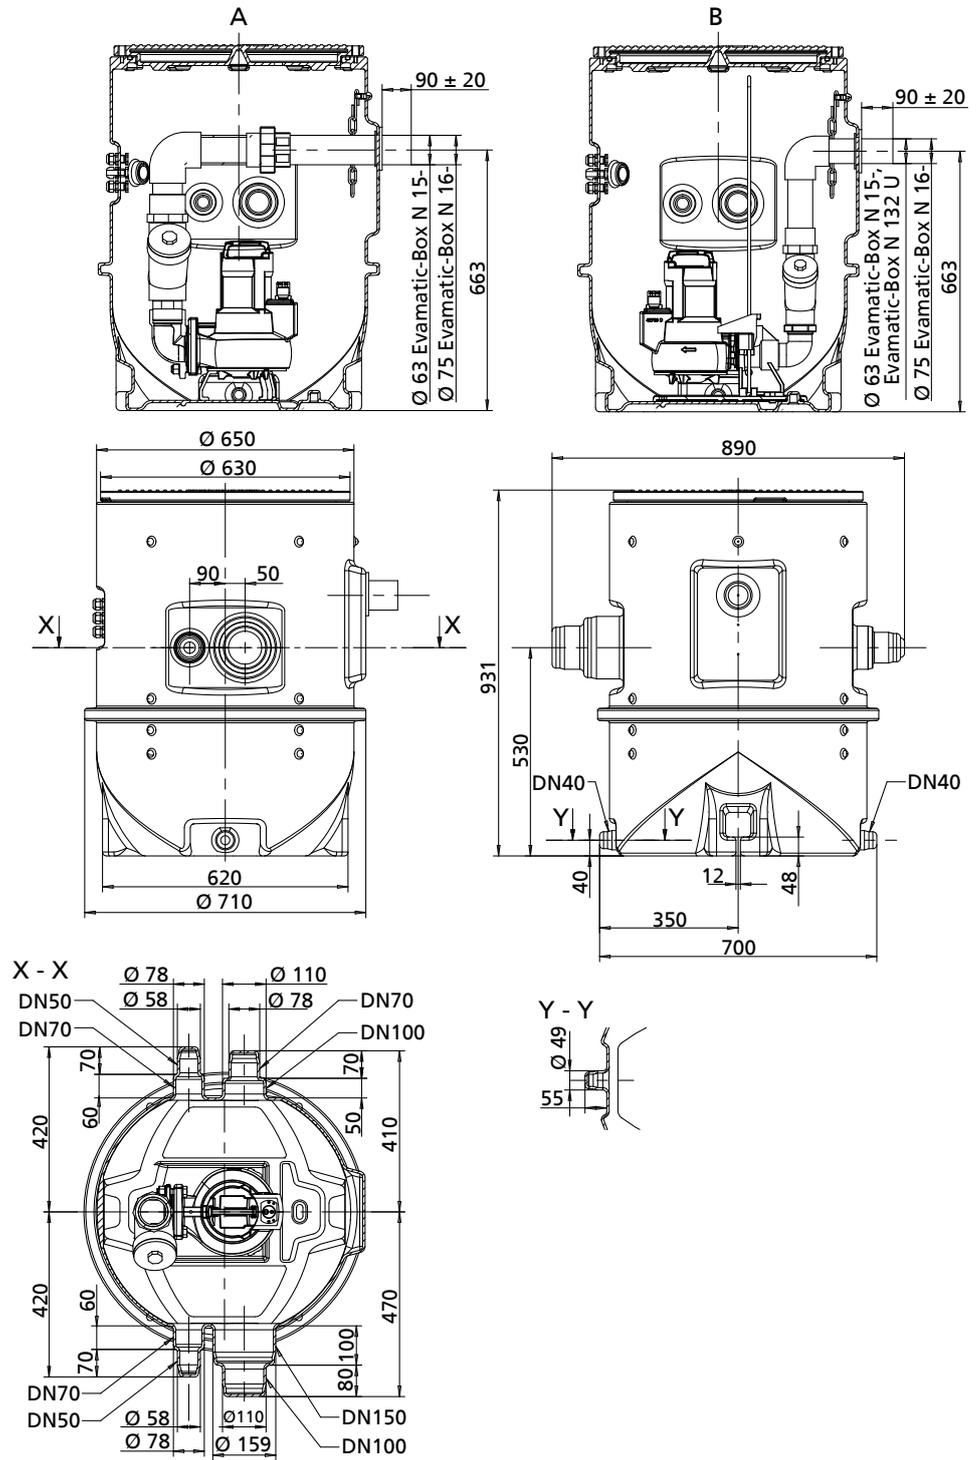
Outline drawing of Evamatic-Box N 200 I
